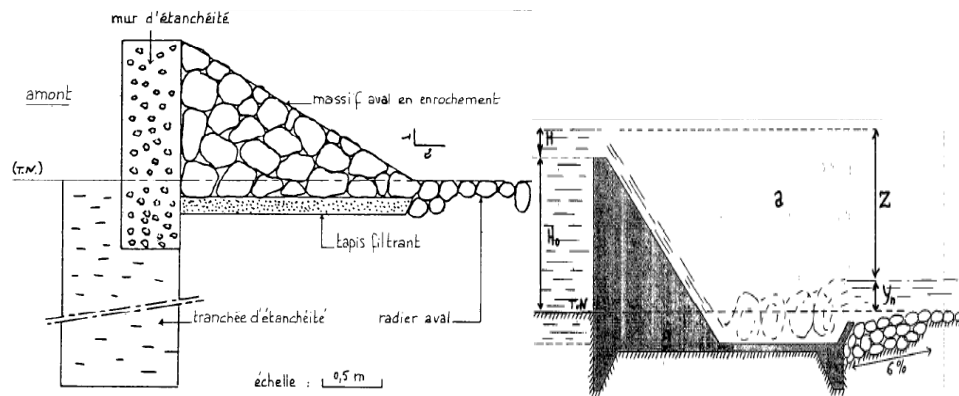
Typical profile of a cyclopean concrete dike and gabion rockfill counter-bracing and a concrete spillway
